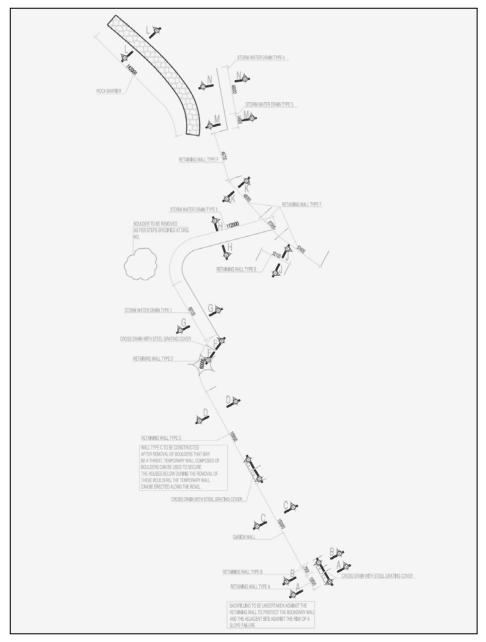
Tentative plan for Hermitage (slope failures and rockfalls) (Source: MPI)
